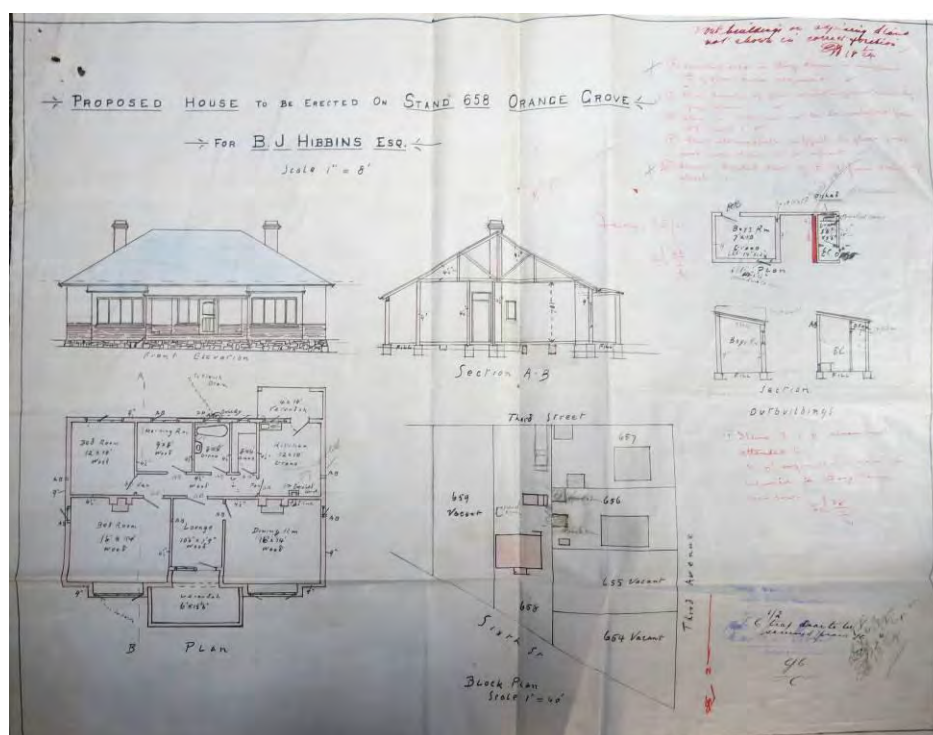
Plan for proposed new houses on Stands 658, Orange Grove from 1924
